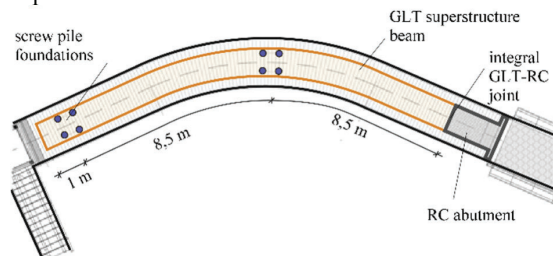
Plan view of the Stuttgart Timber Model Bridge
